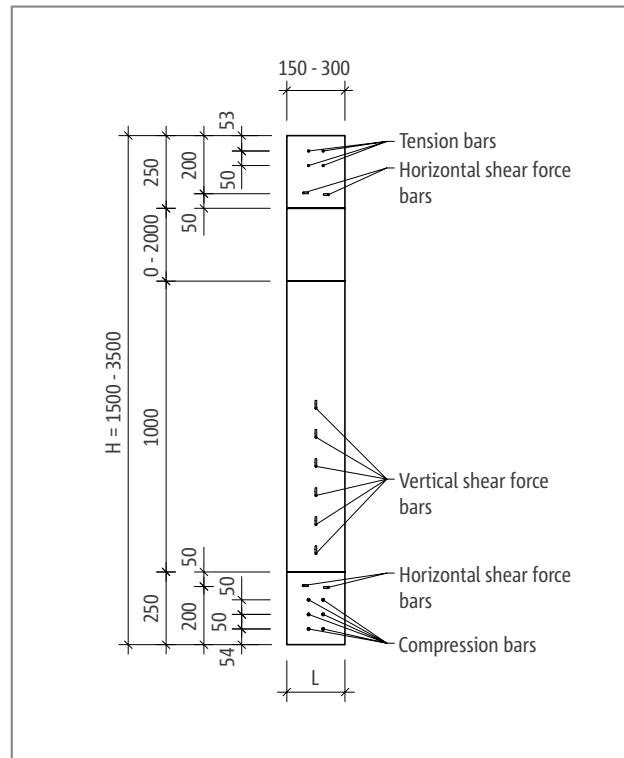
Schöck Isokorb® T type W for R0: Product layout; perimeter fire protection boards
